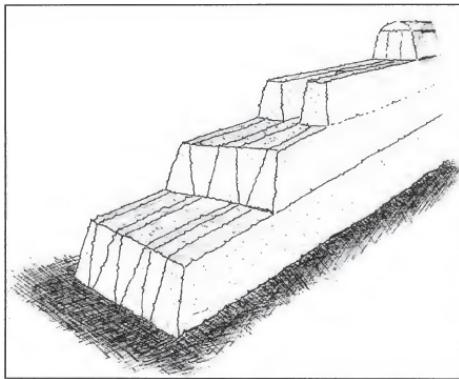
Tapia wall construction, Source: (Via di , S. Michele, 1983)
